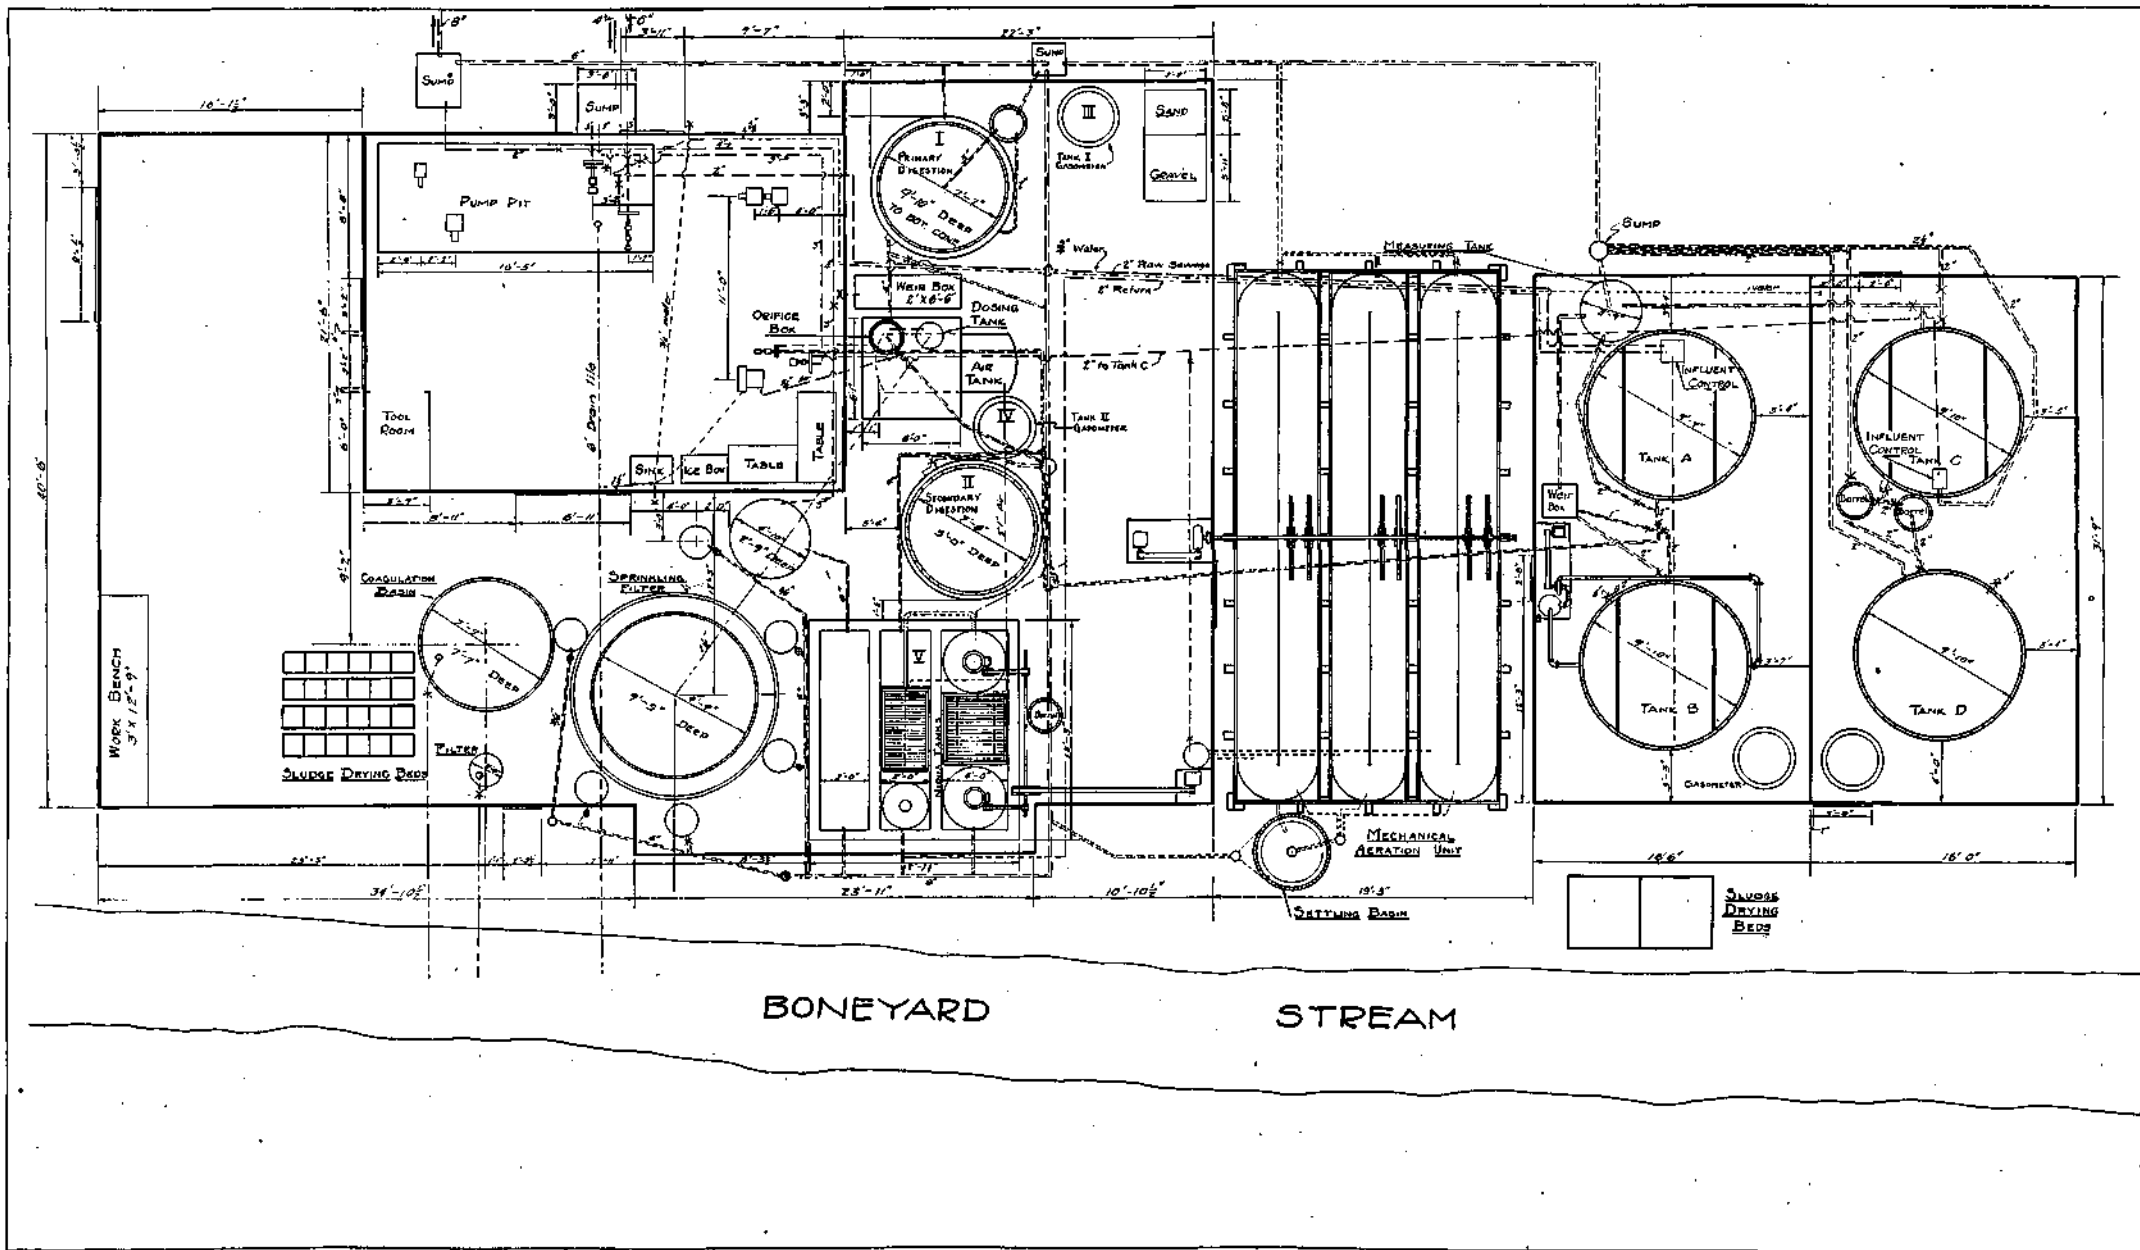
GENERAL LAYOUT OF SEWAGE EXPERIMENT STATION.
